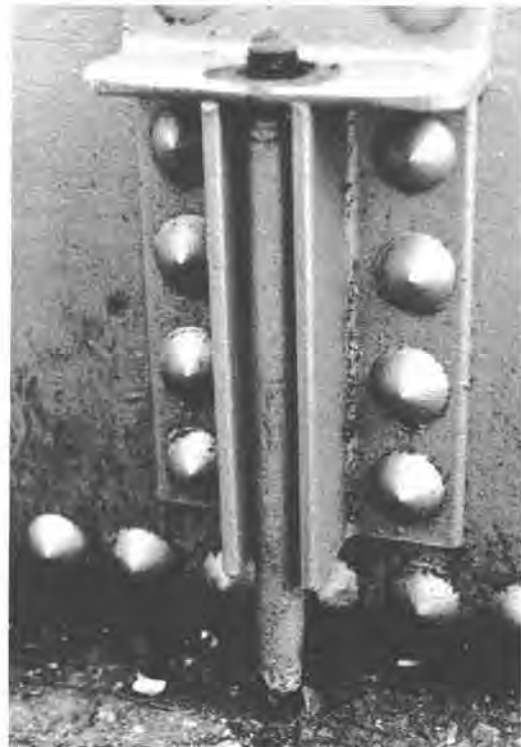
Typical anchor bolt damage at Woodland Park Standpipe, Seattle. Note that the anchor bolt has necked where it meets the concrete and that the bolt failed in the threads. (Photo by Washington Surveying and Rating Bureau.)
